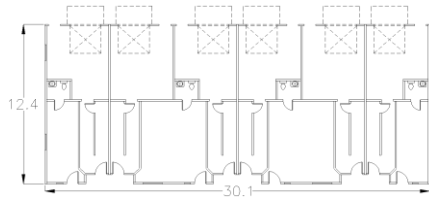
Index building 1st floor plan for a 3-story multi-family residential building (dimensions in meters)
